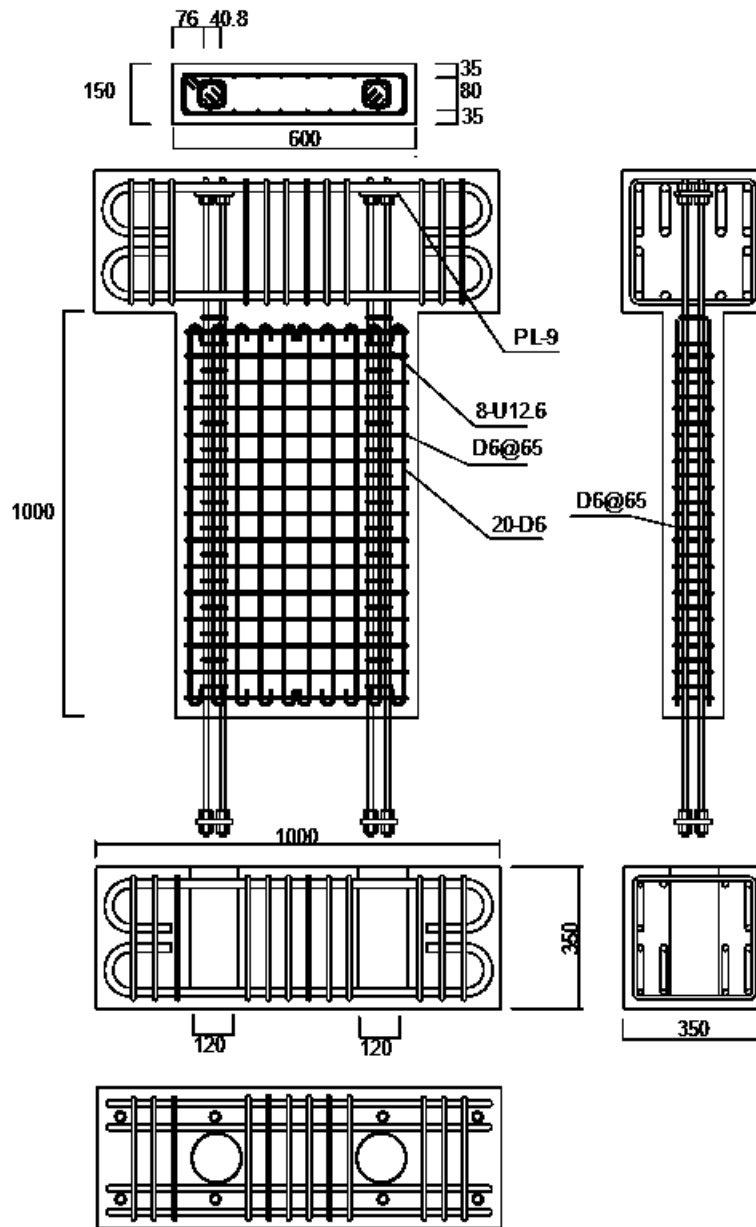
Reinforcement details of test shear walls (Unit: mm)
